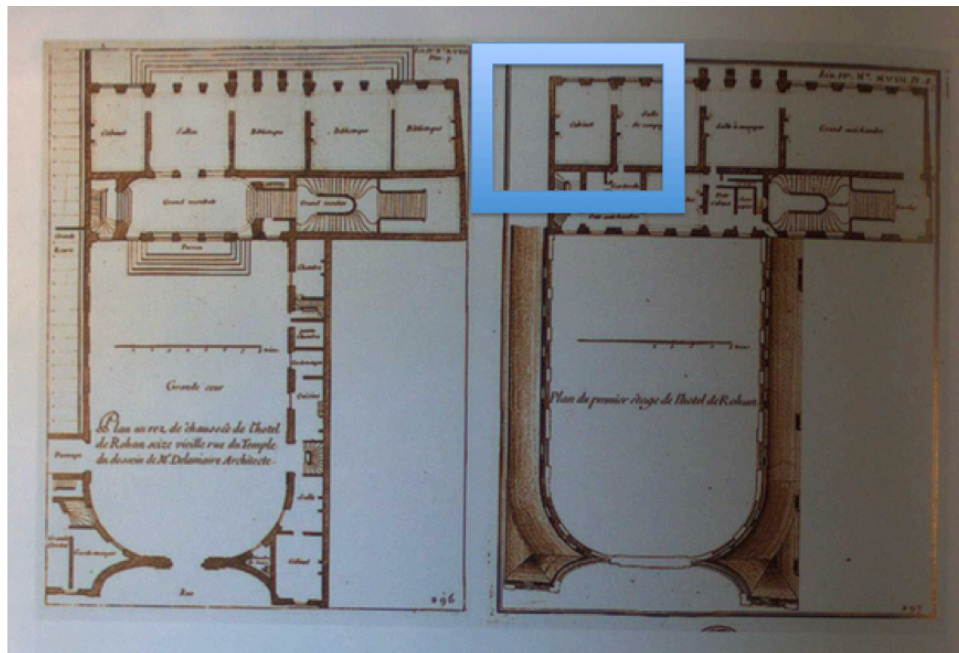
Floor Plan of l'Hôtel Rohan-Strasbourg, *Singerie* is highlighted in blue, c.1740.
